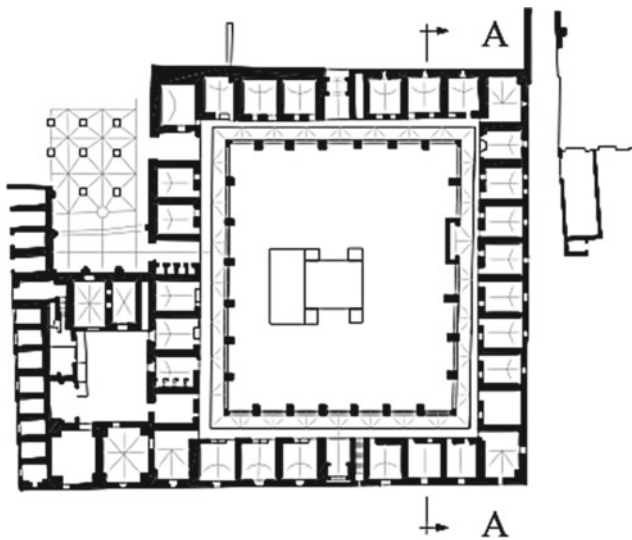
First floor plan of Khan Al faring. *Source Fouad (2018)
